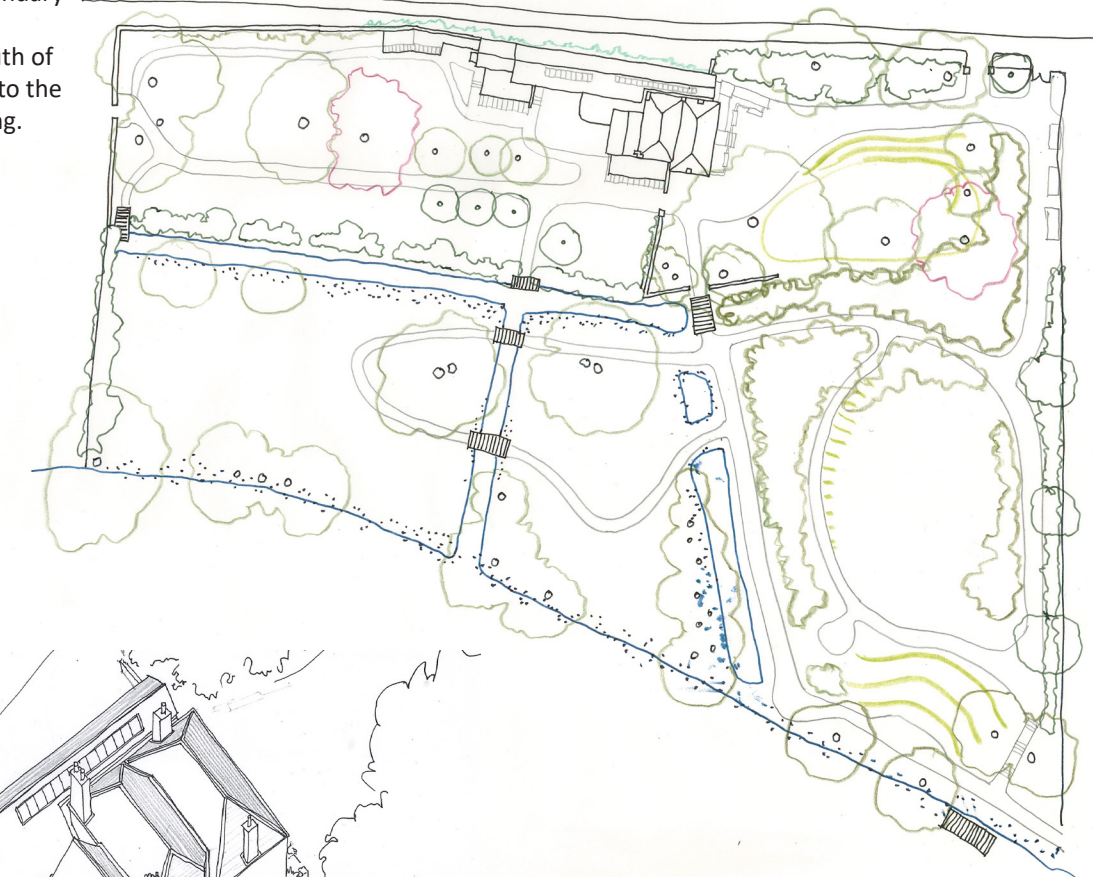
Plan of the boundary wall scheme, in the context of the overall site
